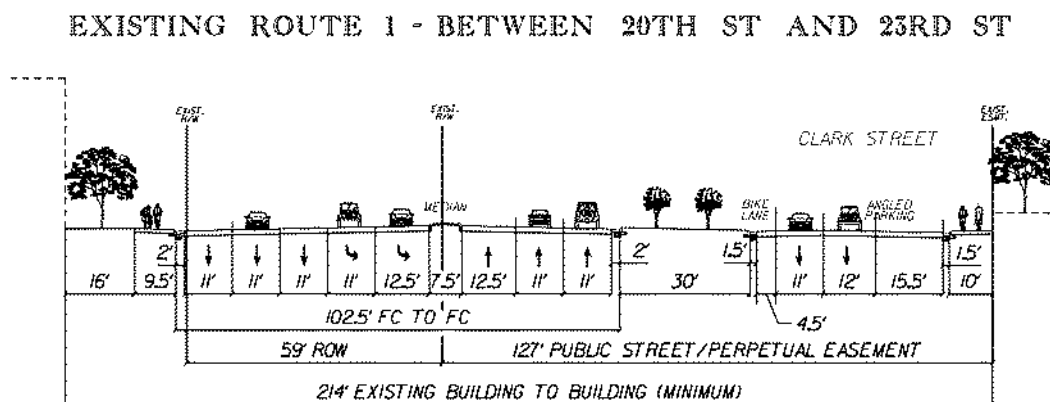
Existing Route 1 Cross Section Between 23rd Street S and 20th Street S Cross Section (looking north)
